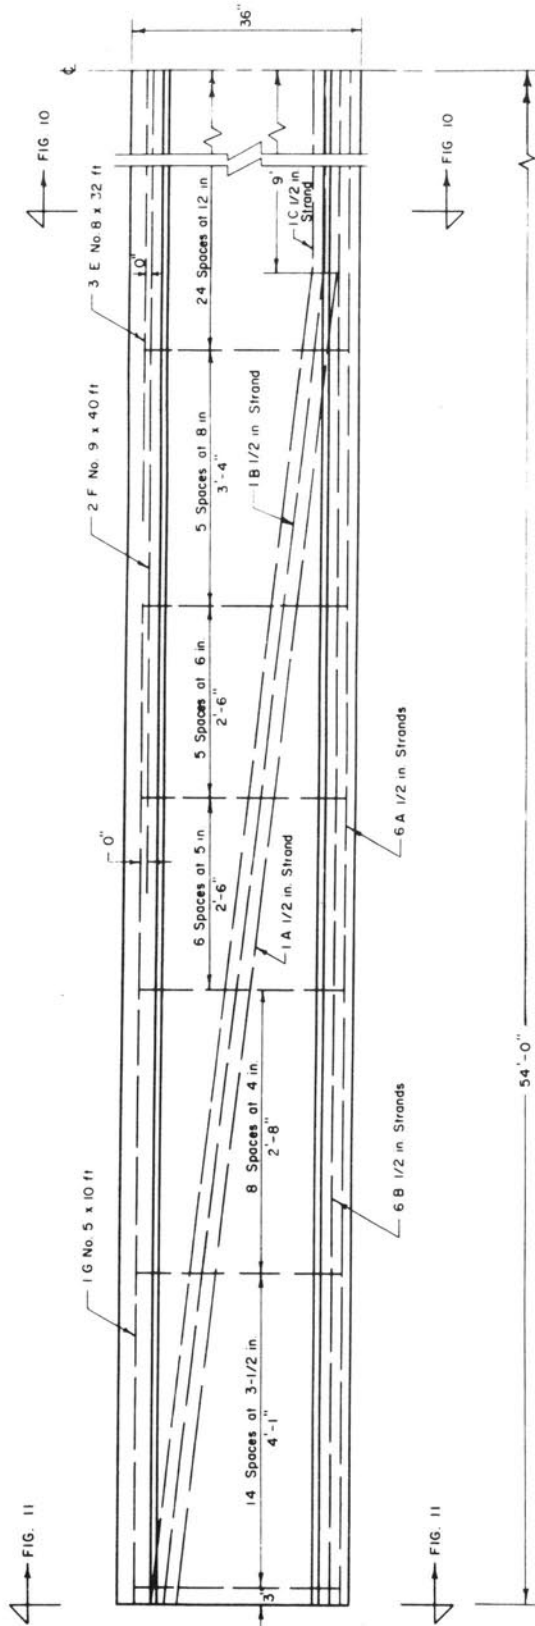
ELEVATION OF BEAM OF EXAMPLE 3
